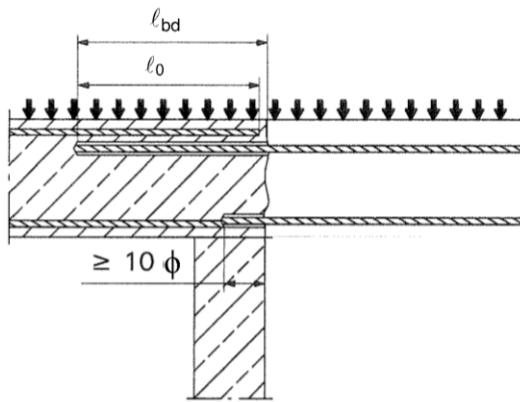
End anchoring of slabs or beams (e.g. designed as simply supported)
